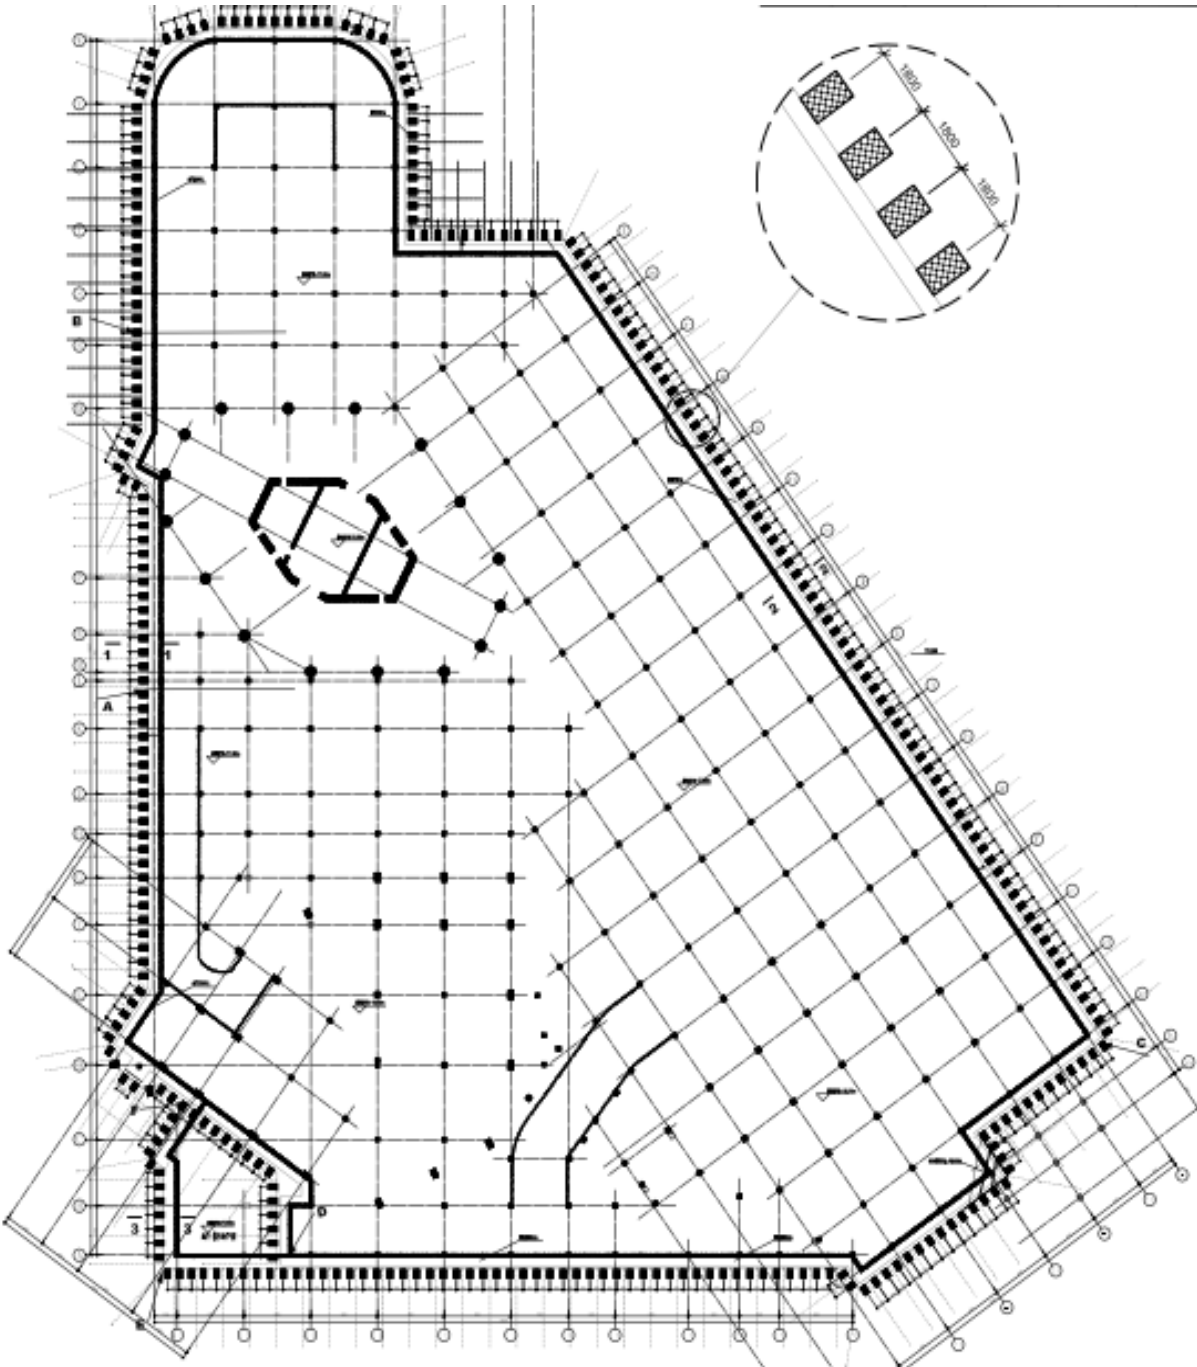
Site layout for the Commercial Bank of Ethiopia New Headquarter Building
